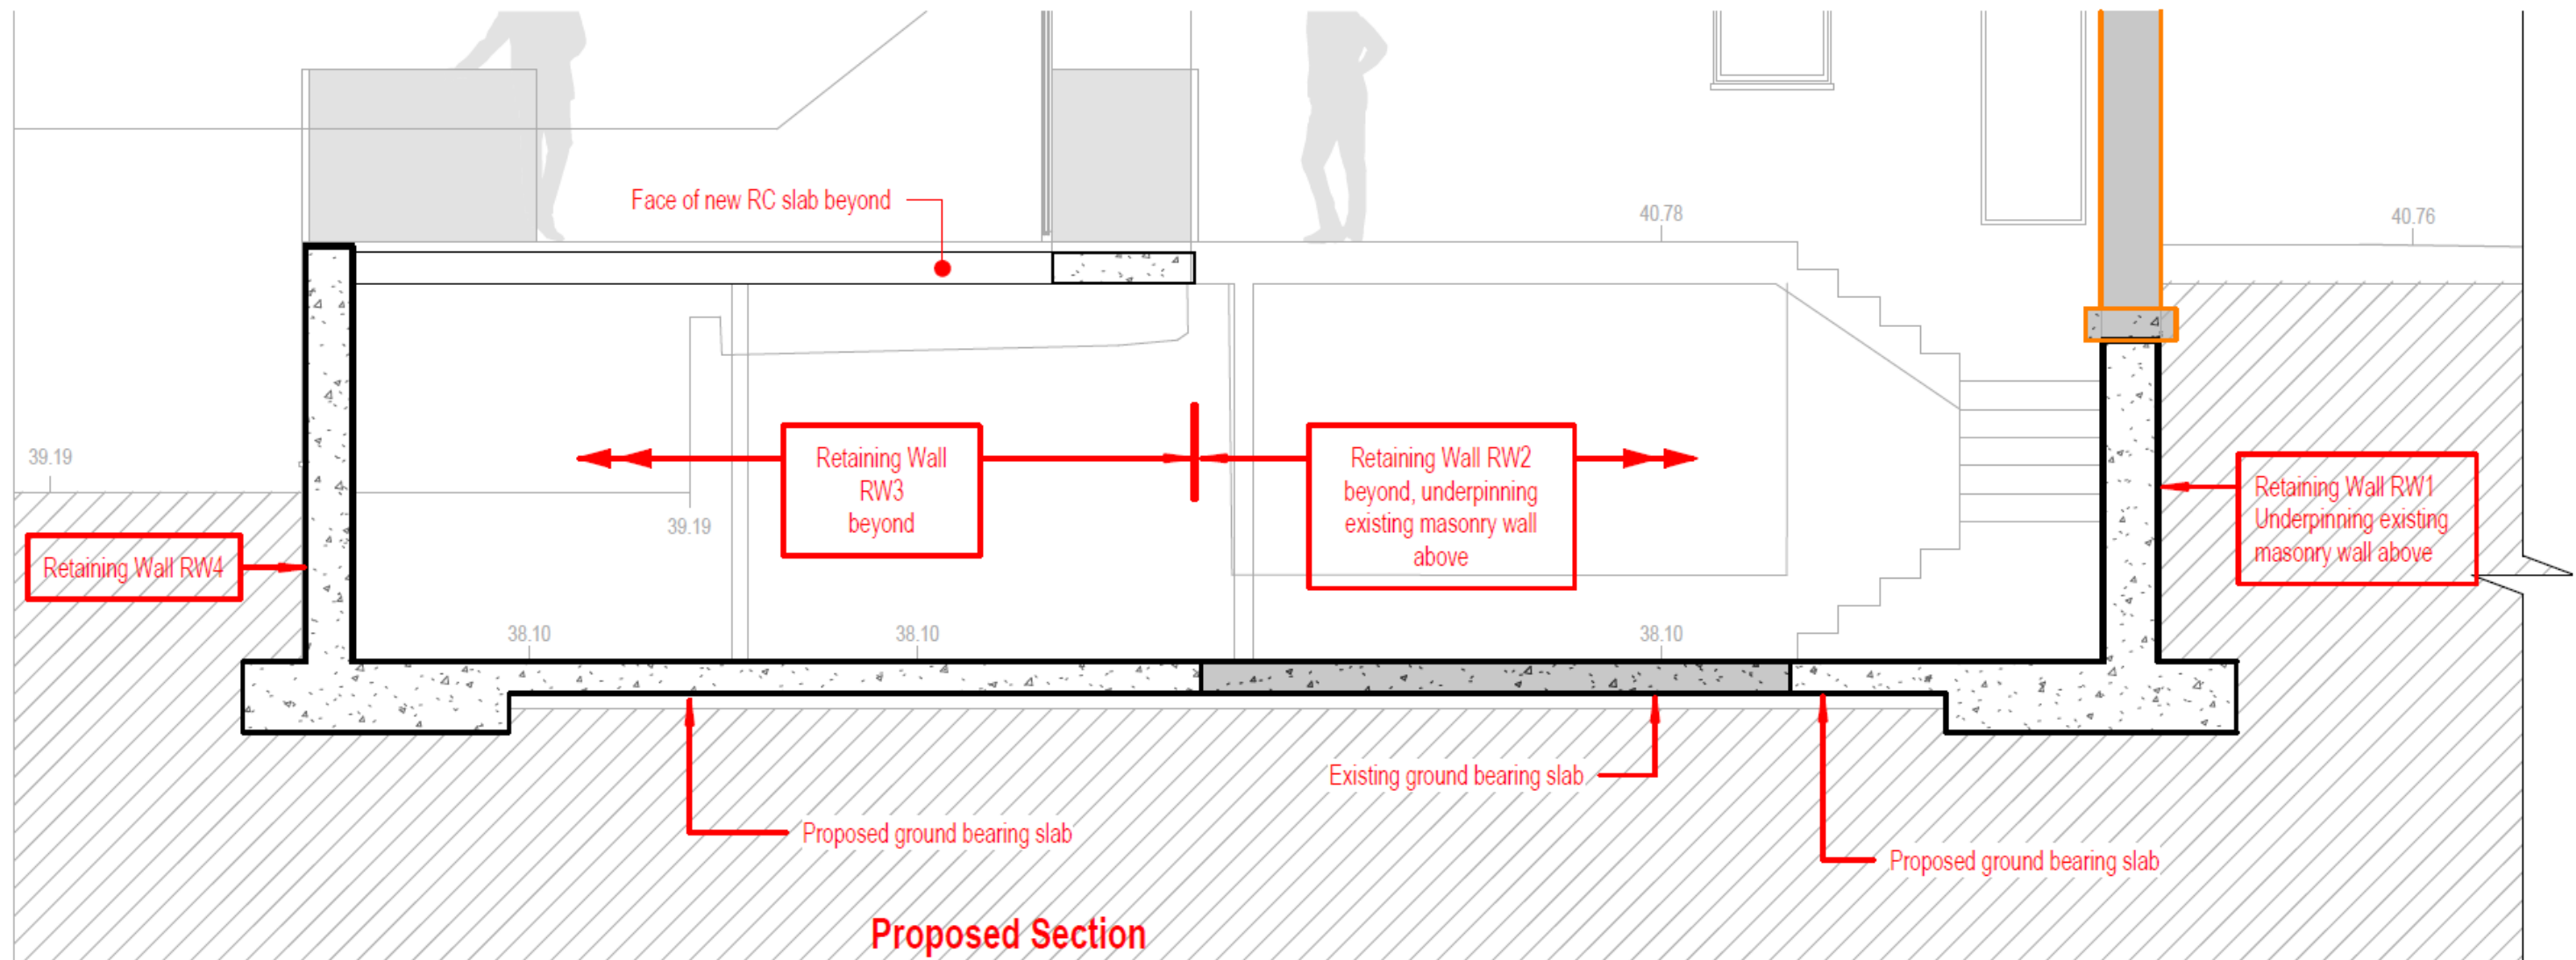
SK03 - Existing ground floor and proposed retaining walls (not to scale)
